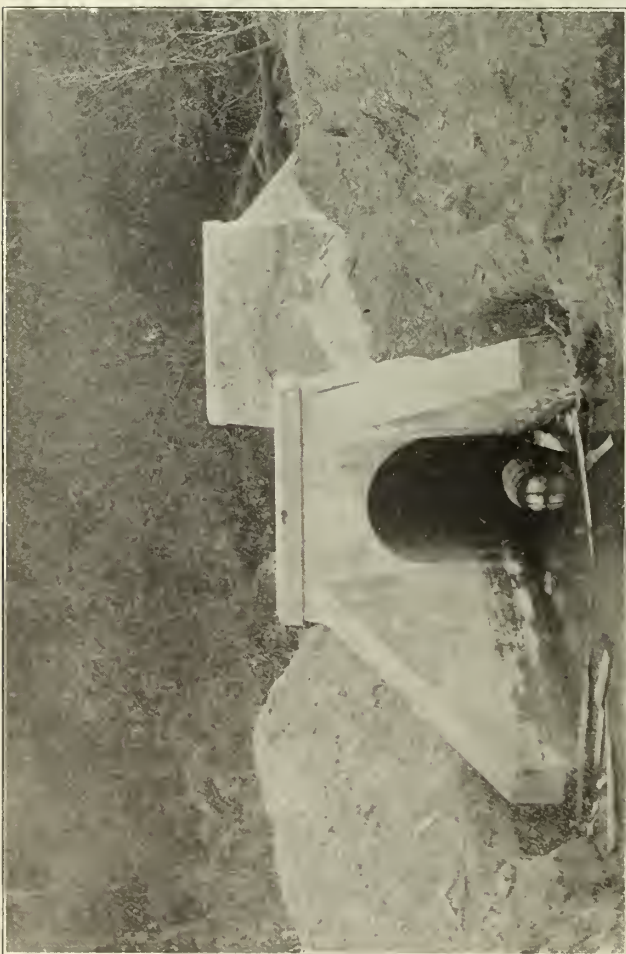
Concrete Arch Culvert, 6-Foot Span, Western Maryland Ry. Extension.
